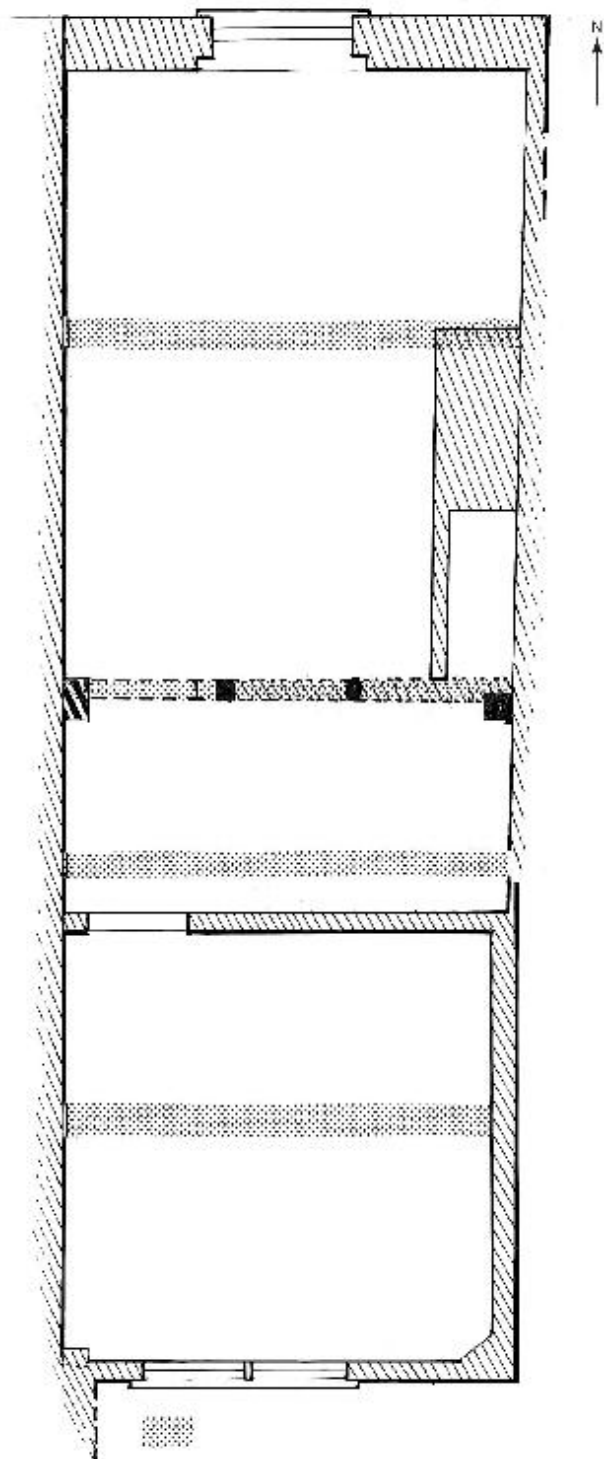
Ground-floor plan of 7 St Peter's Street, with the street to the top. A simple two-cell, in-line, narrow plan. Dotted lines relate to bridging beams
